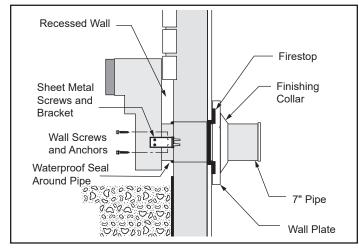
Use extension brackets to mount snorkel against recessed wall.
